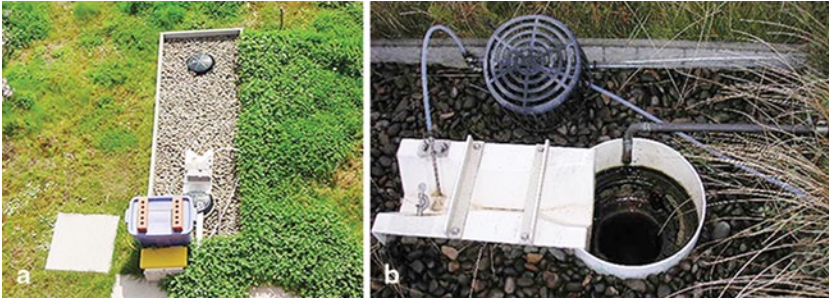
Drain a and flume b setup on the Hamilton Ecoroof for stormwater outflow monitoring (City of Portland, BES)
